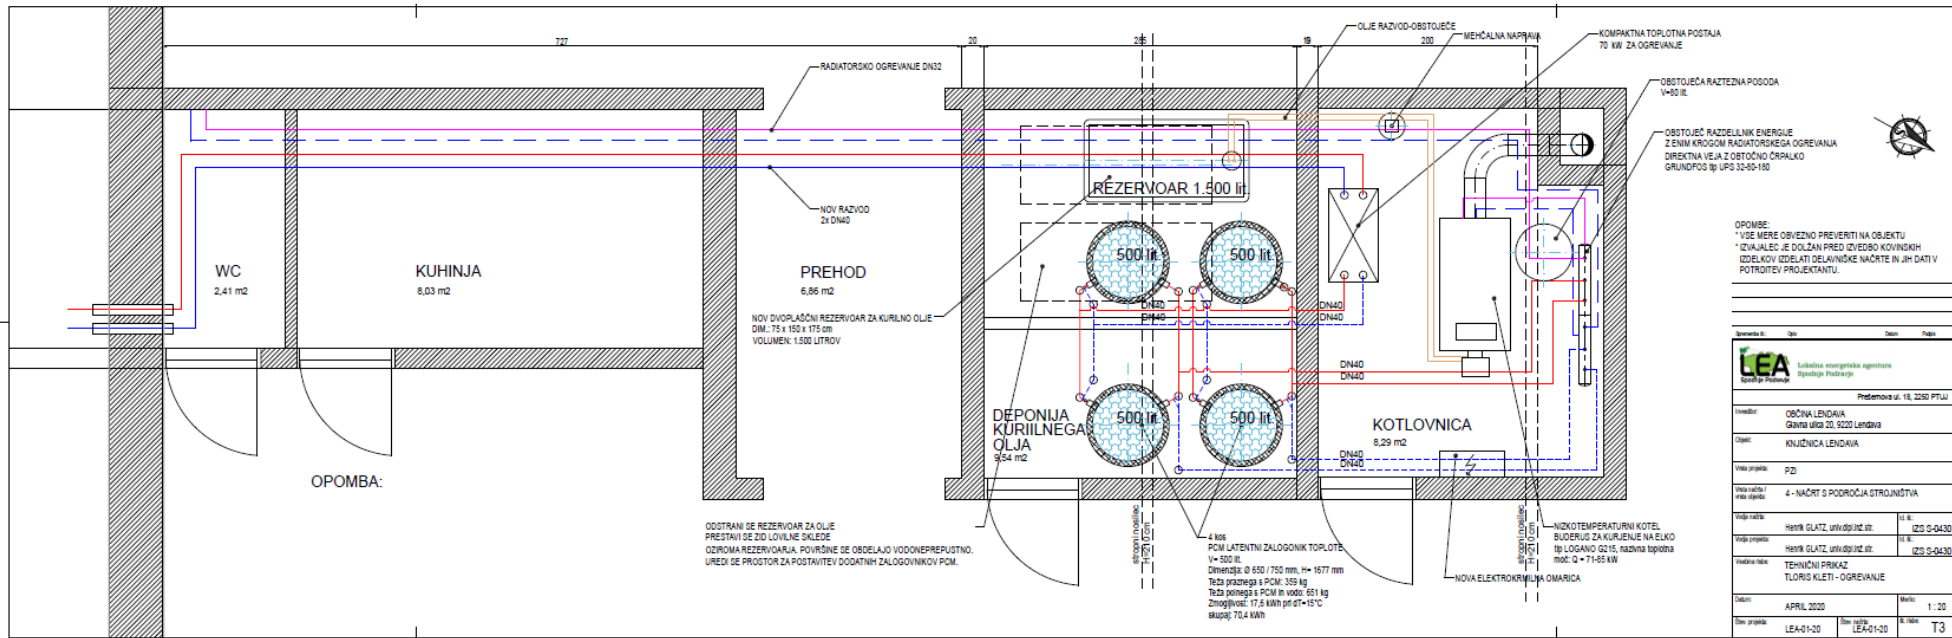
Floor plan of the planned newly installed 4 PCM storages in accordance with the newly implemented control and EMS syste
